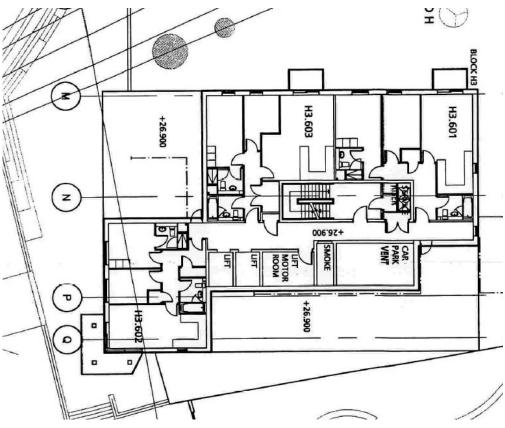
Benoy approved Level 6 layout with heighened living/kitchen space
